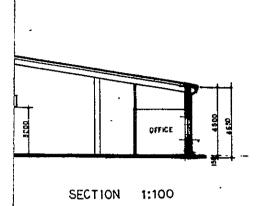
Custom Built Factory Type II, Sectional Detail
